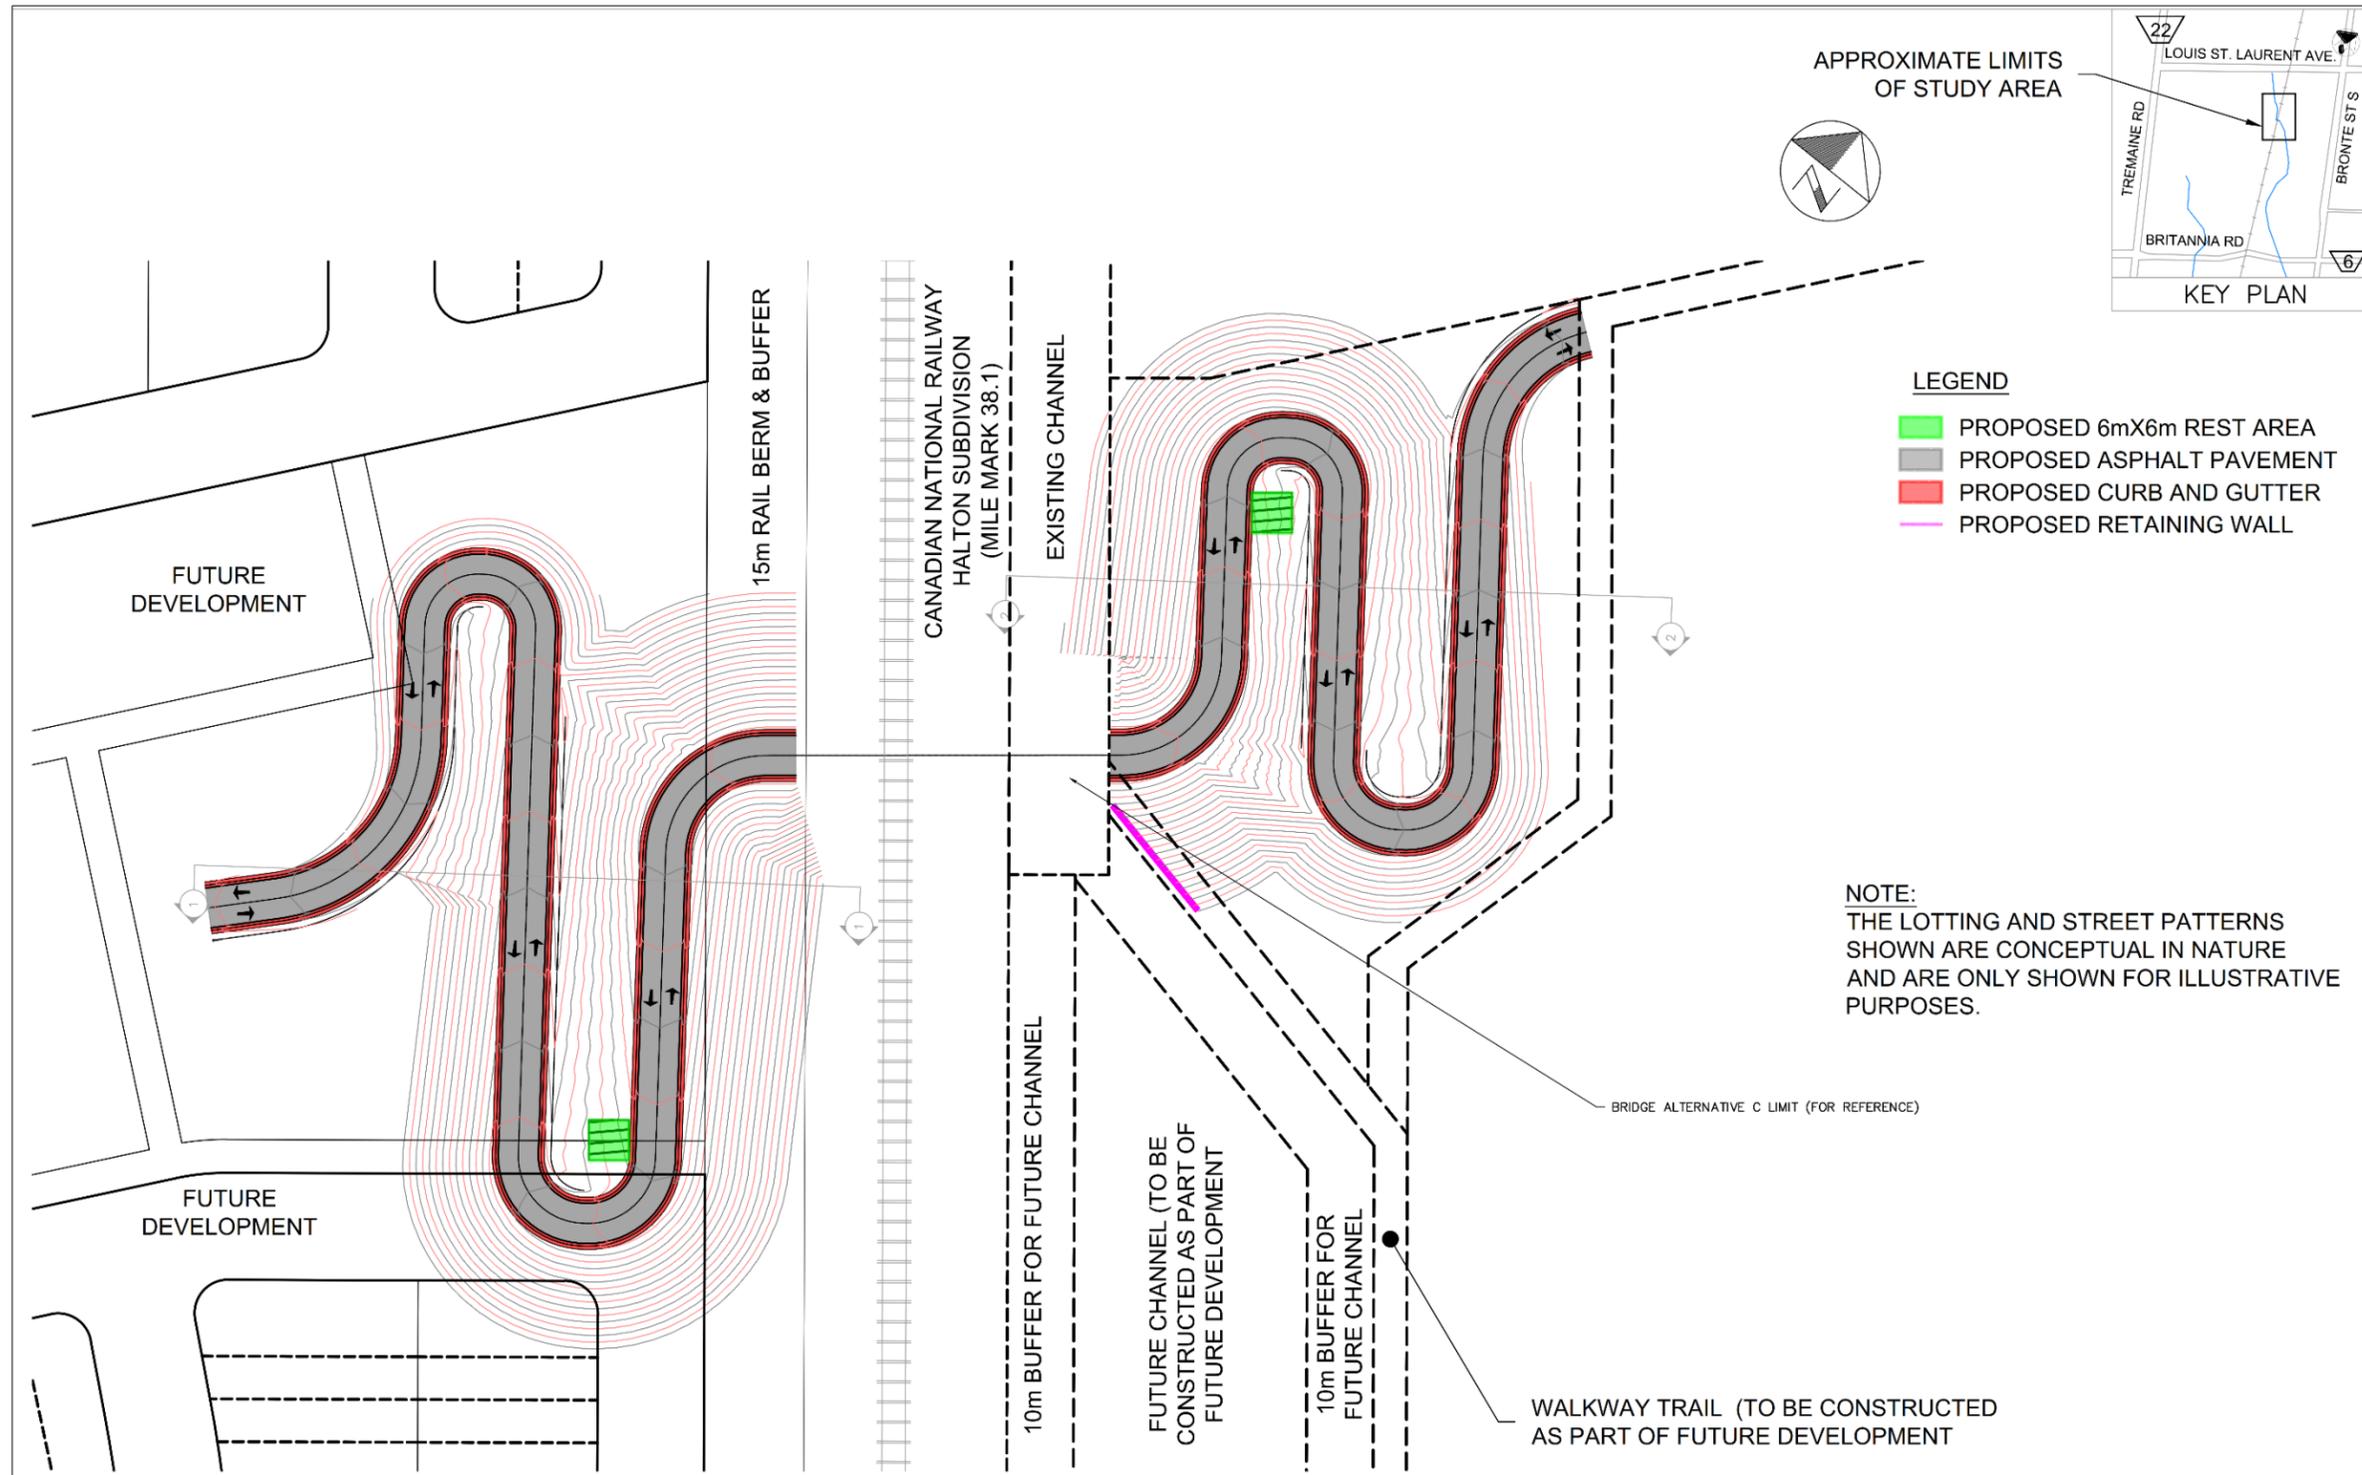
Bridge Approach Alternative 4 - Ramp Approach
